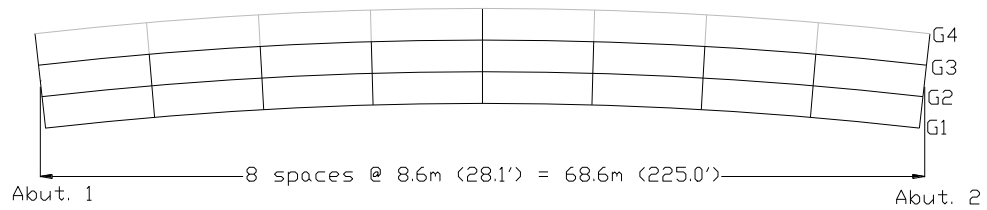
Stage 3 of Construction for Single Girder (Inner Girder Placed First) Erection of Single-Span, 4-Girder, 305-m (1000-ft) Radius Bridge.
